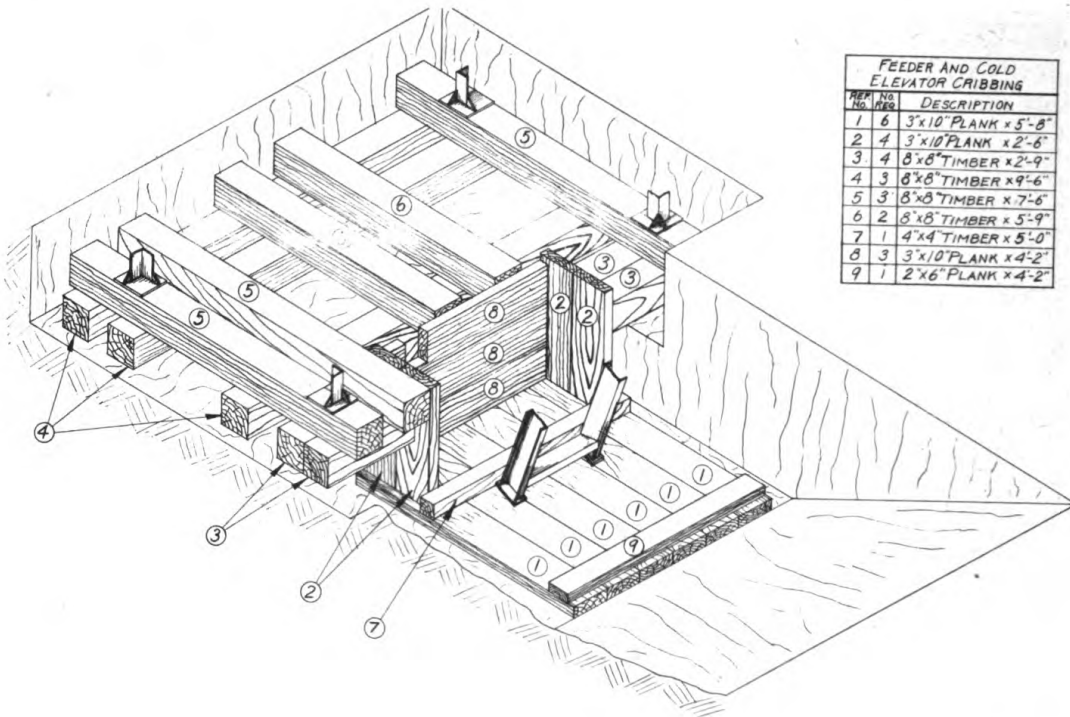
BLOCKING FOR RECIPROCATING FEEDER, COLD ELEVATOR AND FEEDER HOPPER.
